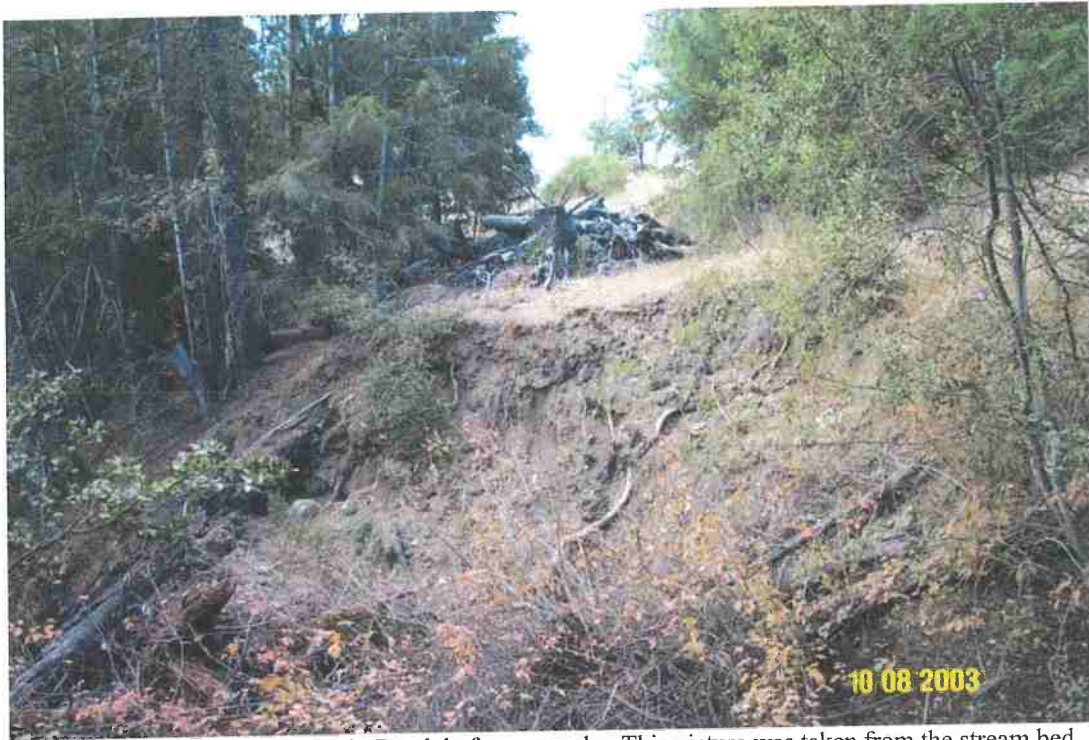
Site #6.1 Reed Mountain Road, before upgrade. This picture was taken from the stream bed looking at the steep, eroding vertical bank.
